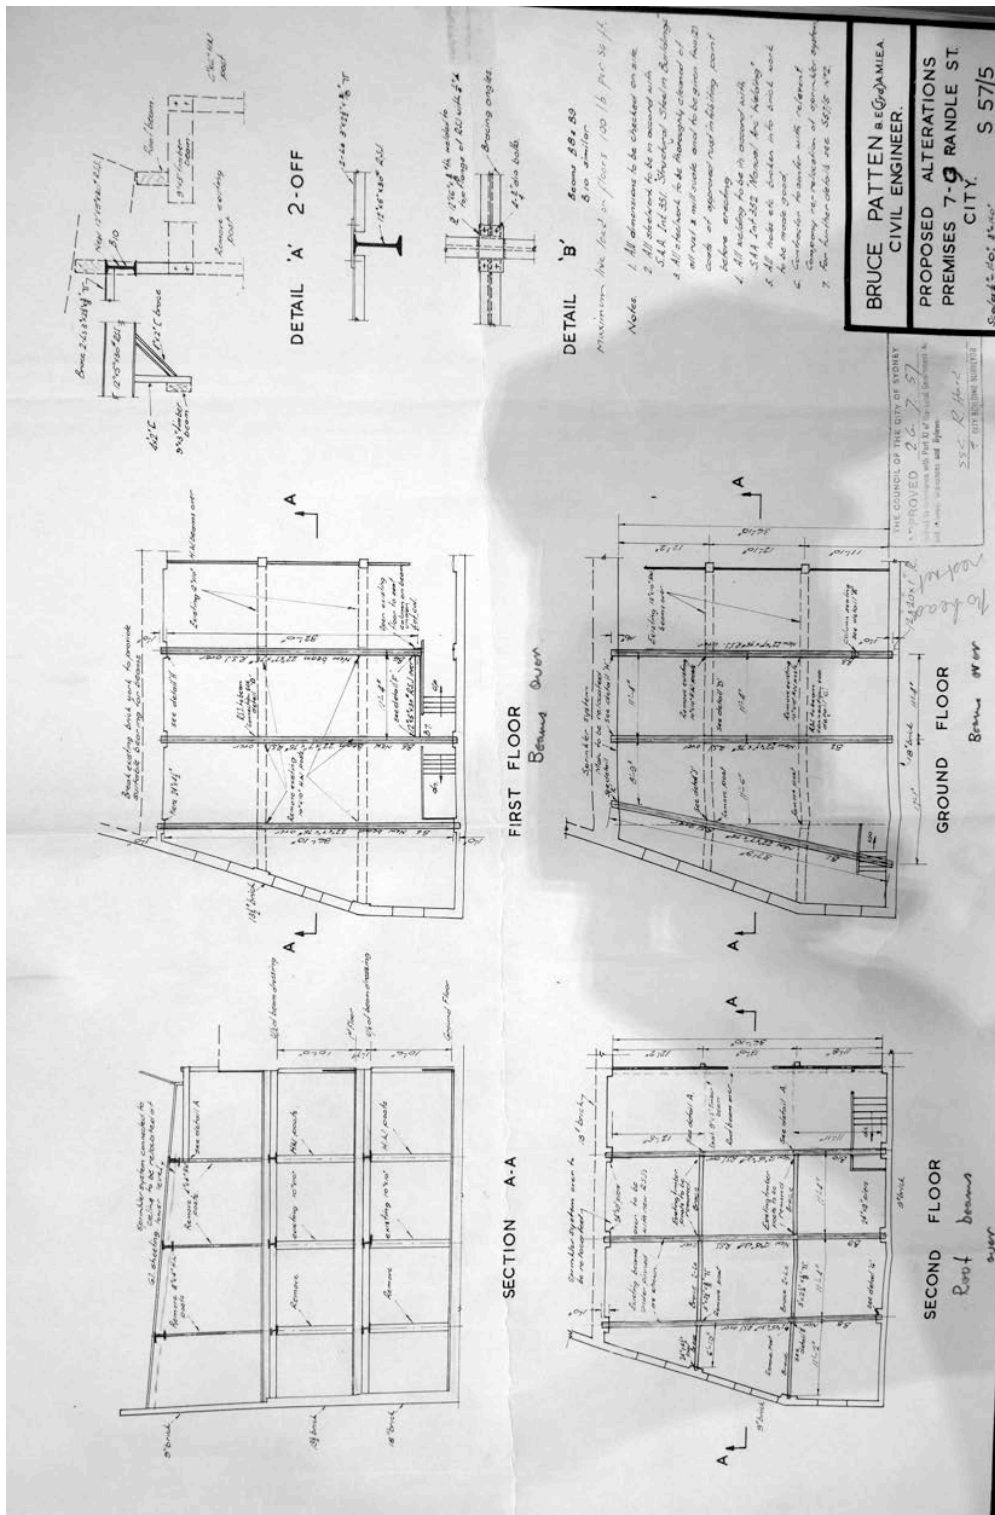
Plan of structural alterations undertaken in 1956. This work replaced much of the original hardwood frame with RSJs
